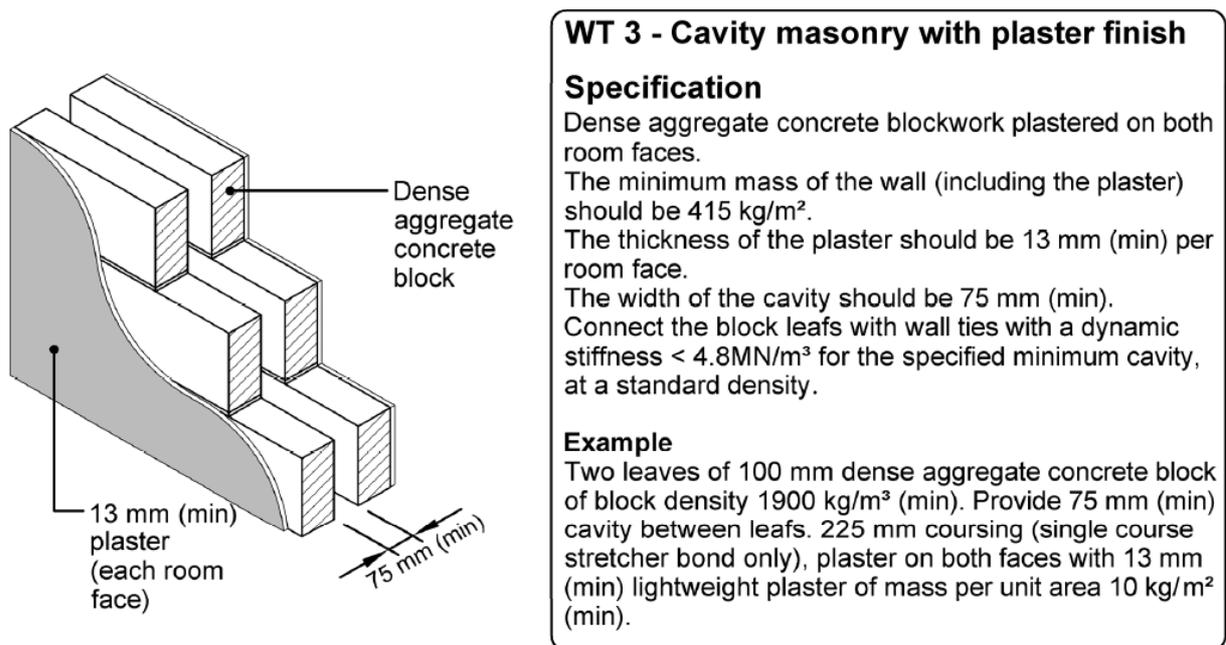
Diagram 12 from TGD Part-E – Cavity masonry wall with plaster finish
